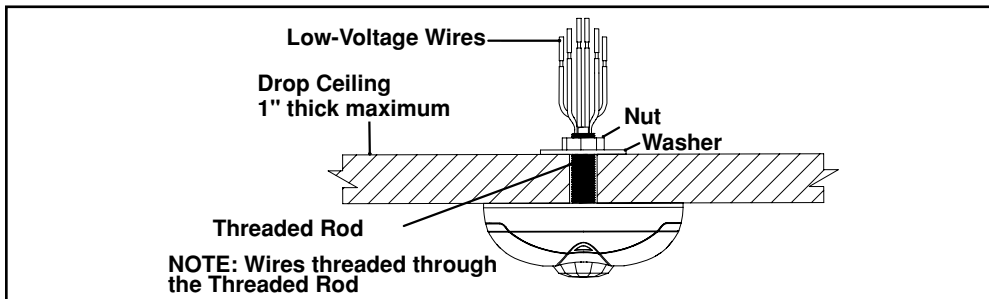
SMC-C CEILING MOUNT INSTALLATION
